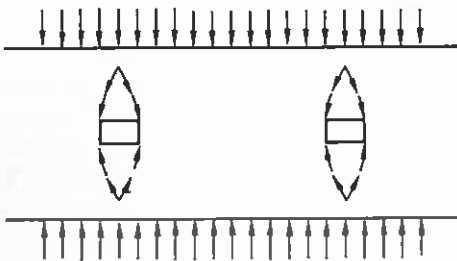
(c) Construction of tunnels A and D in a high stress field. Stress concentrations on tunnel walls.
